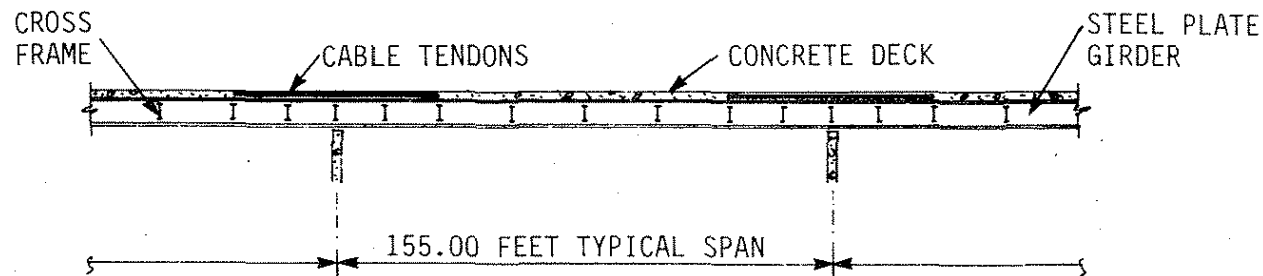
Ten-span, prestressed composite girder, Bonners Ferry Bridge, Idaho, circa 1985.
